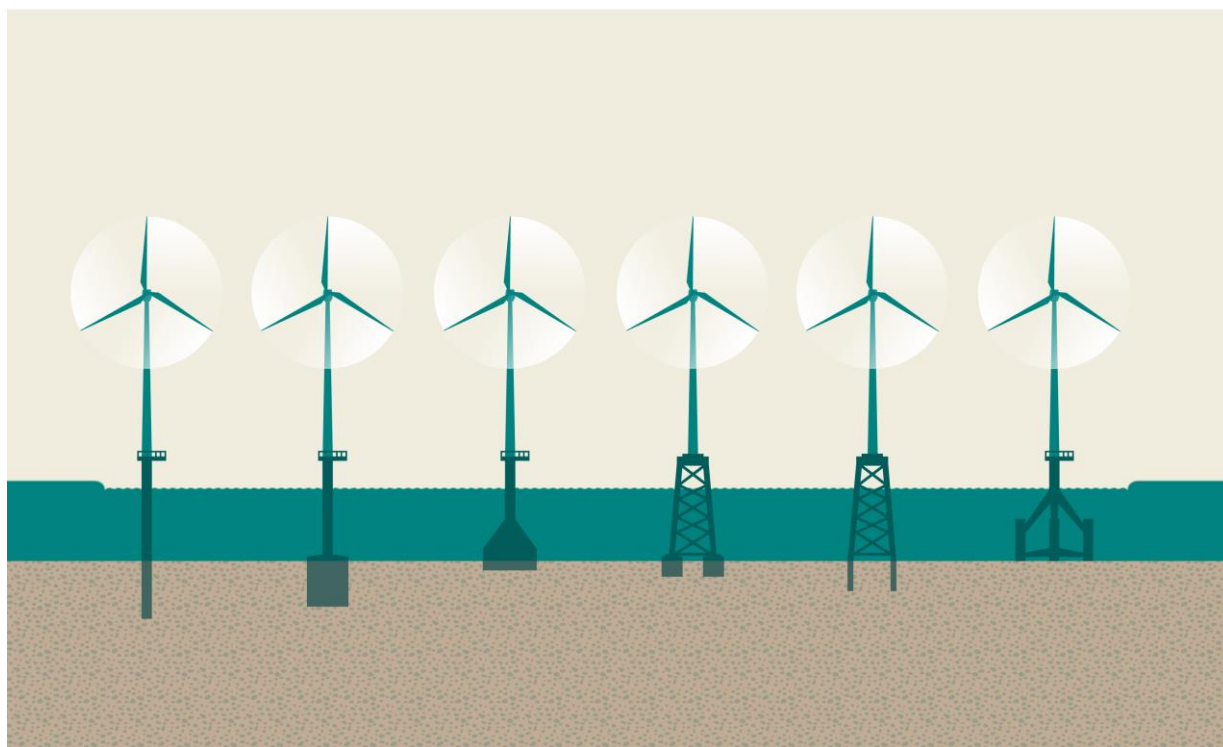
Foundations from left to right: Monopile, monopile with suction buckets, gravity foundation, jacket foundation with suction buckets, jacket foundation with pin piles and tripod foundation with pin piles. Illustrations: Fredrik Folkesson.
